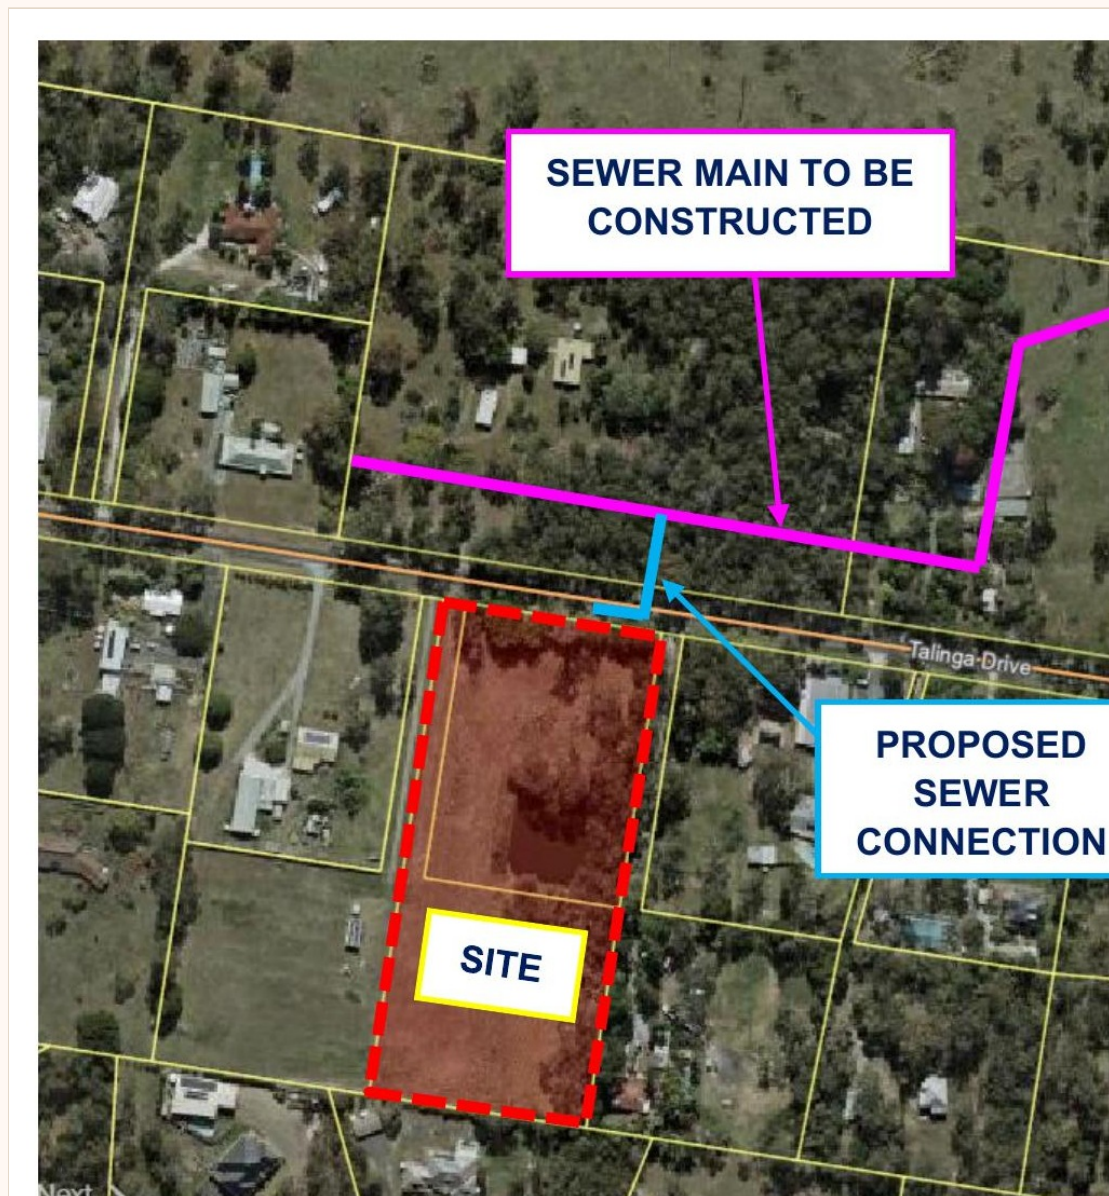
Proposed sewer connection. Gravity main (magenta) to be constructed parallel to Talinga Drive, connecting to the new main within COM/77/2023 on Lot 3 RP131003. Source: Engineering Report & Stormwater Management Plan (24112-ENG-C, Dec 2025).
